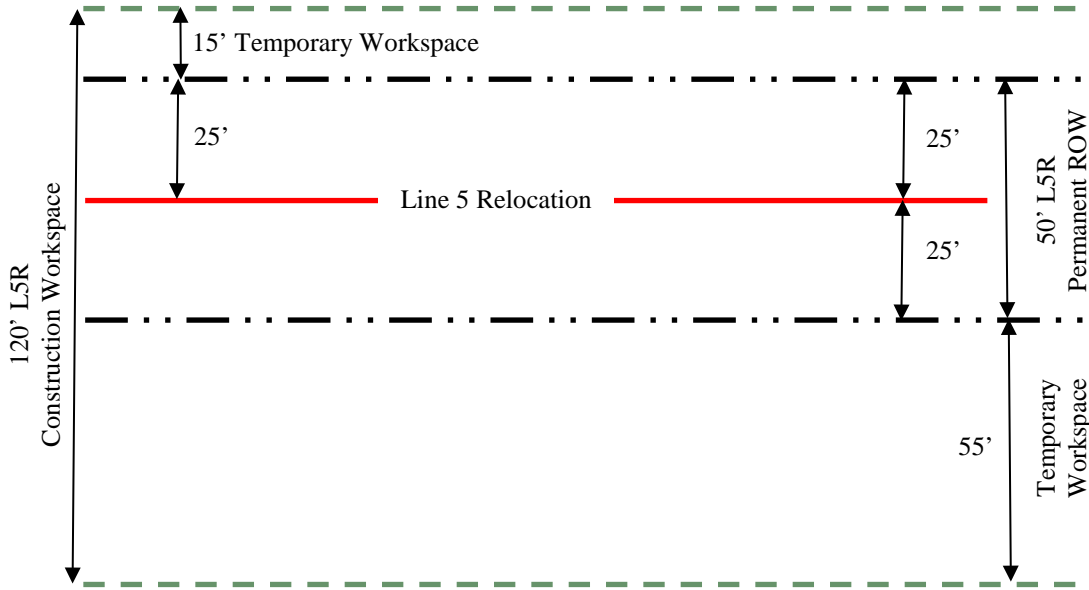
Typical Construction Workspace—Uplands
